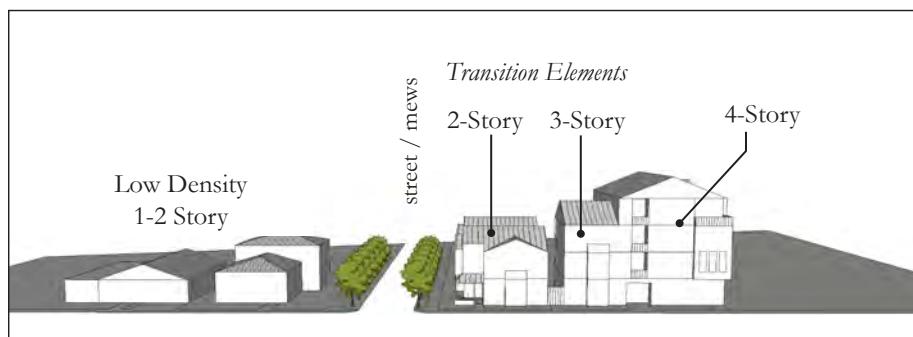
Transitions can also be made by stepping massing down within a project, with lower building elements providing a buffer between taller elements and adjacent lower-density development.
